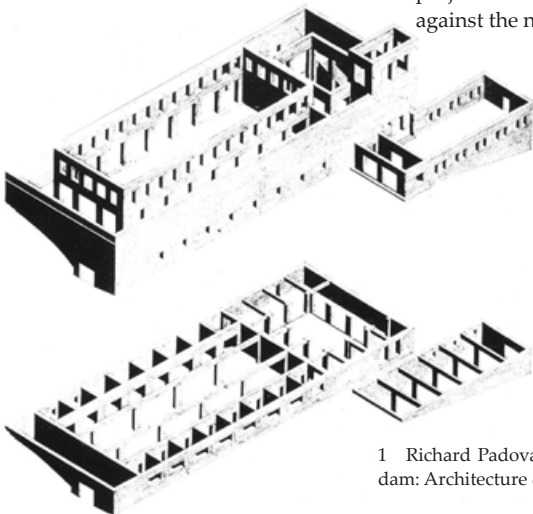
Axonometric drawing of the structural walls of the new church by Van der Laan.
